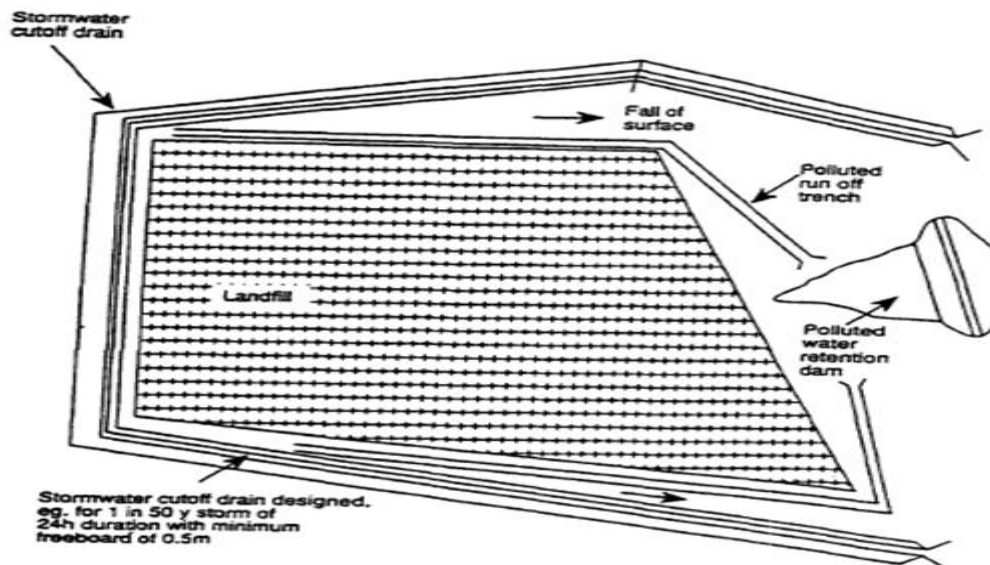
Plan view of Capped Landfill and Surface Water Drainage Channels
